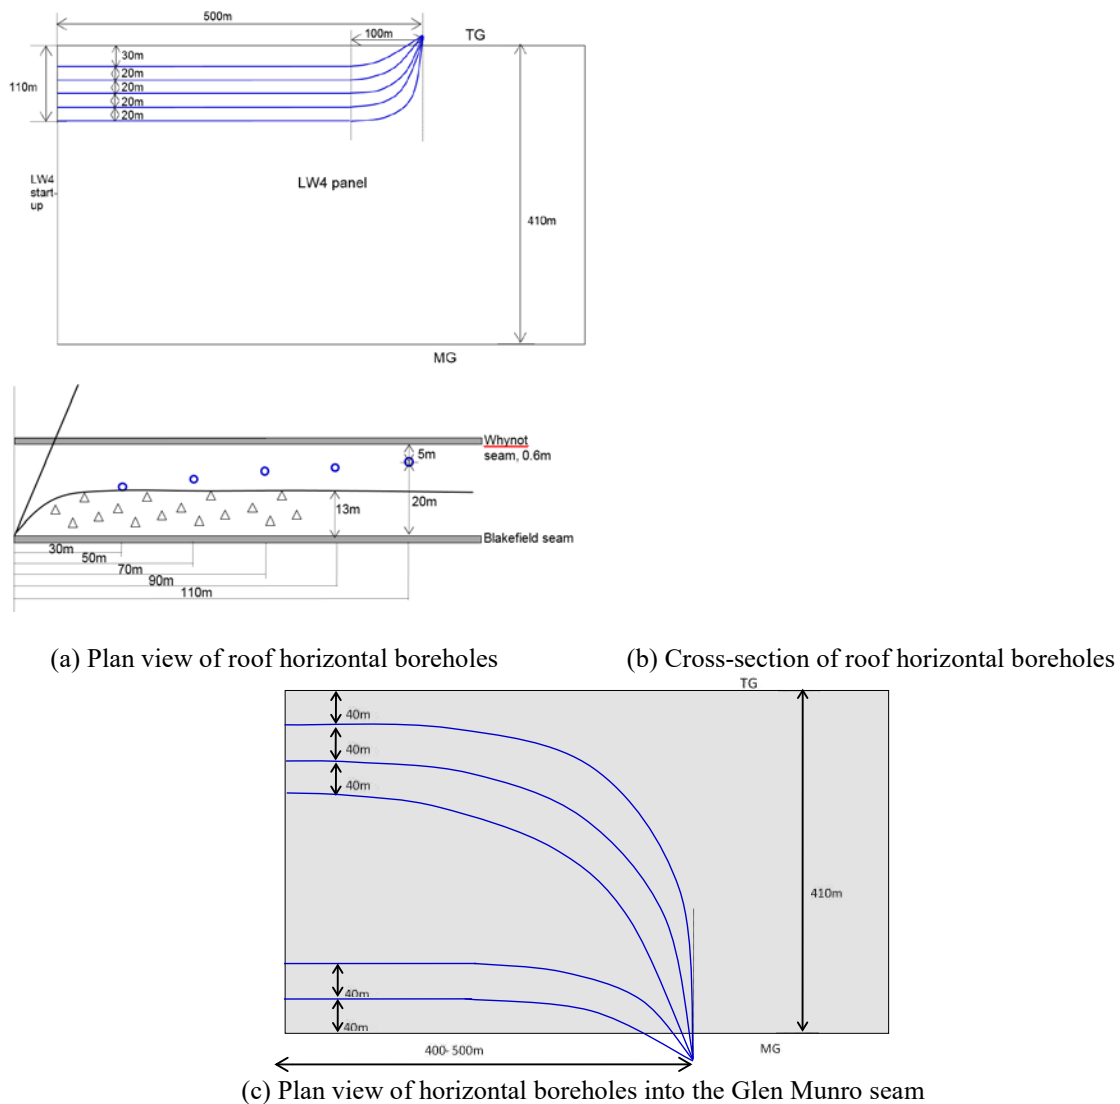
Design of horizontal gas drainage system with underground lateral boreholes.
